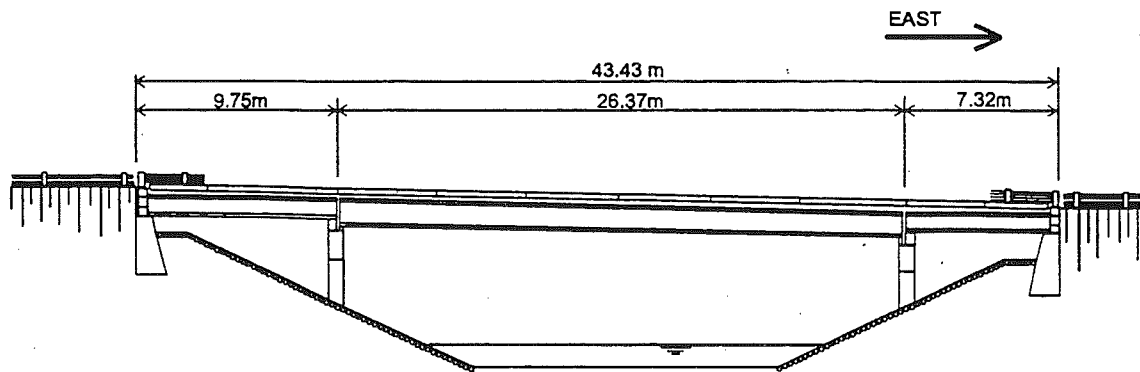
Elevation of Bridge M82/TC (B01-59041).
